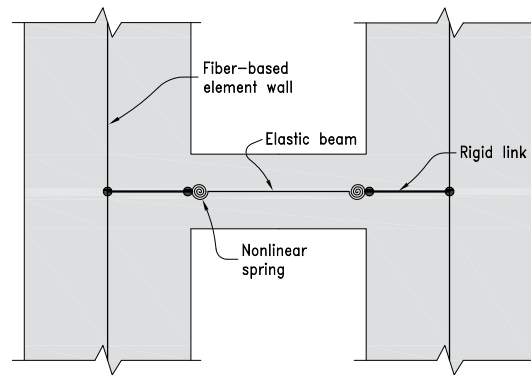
Nonlinear modelling approach of walls and coupling beams.
